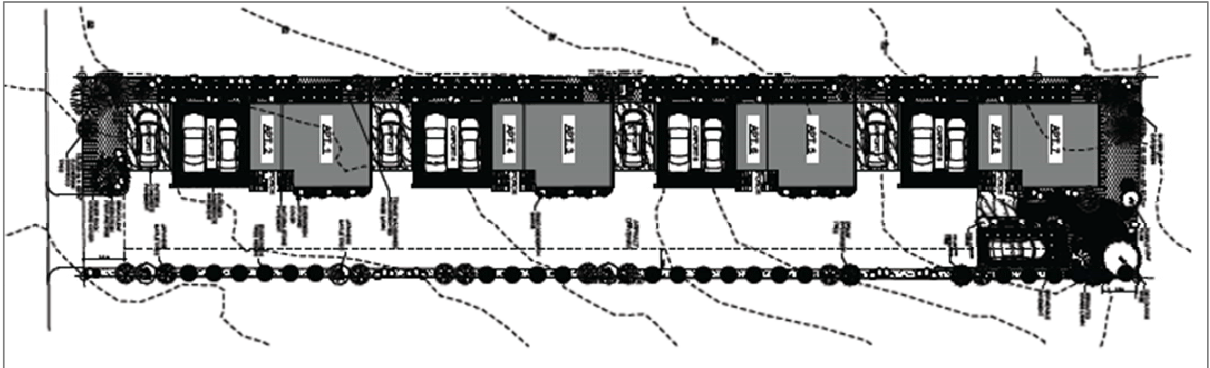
site plan showing layout of proposed 8-unit residential development at 702 Gibsons Way
